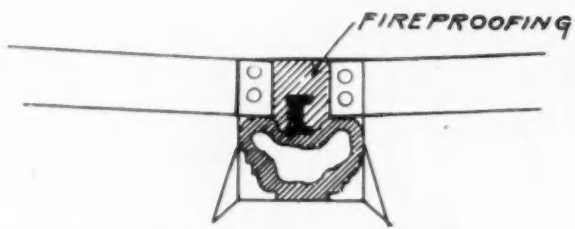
DETAILS OF FIREPROOF CONSTRUCTION. SEE DEPARTMENT ON PAGE 157.
